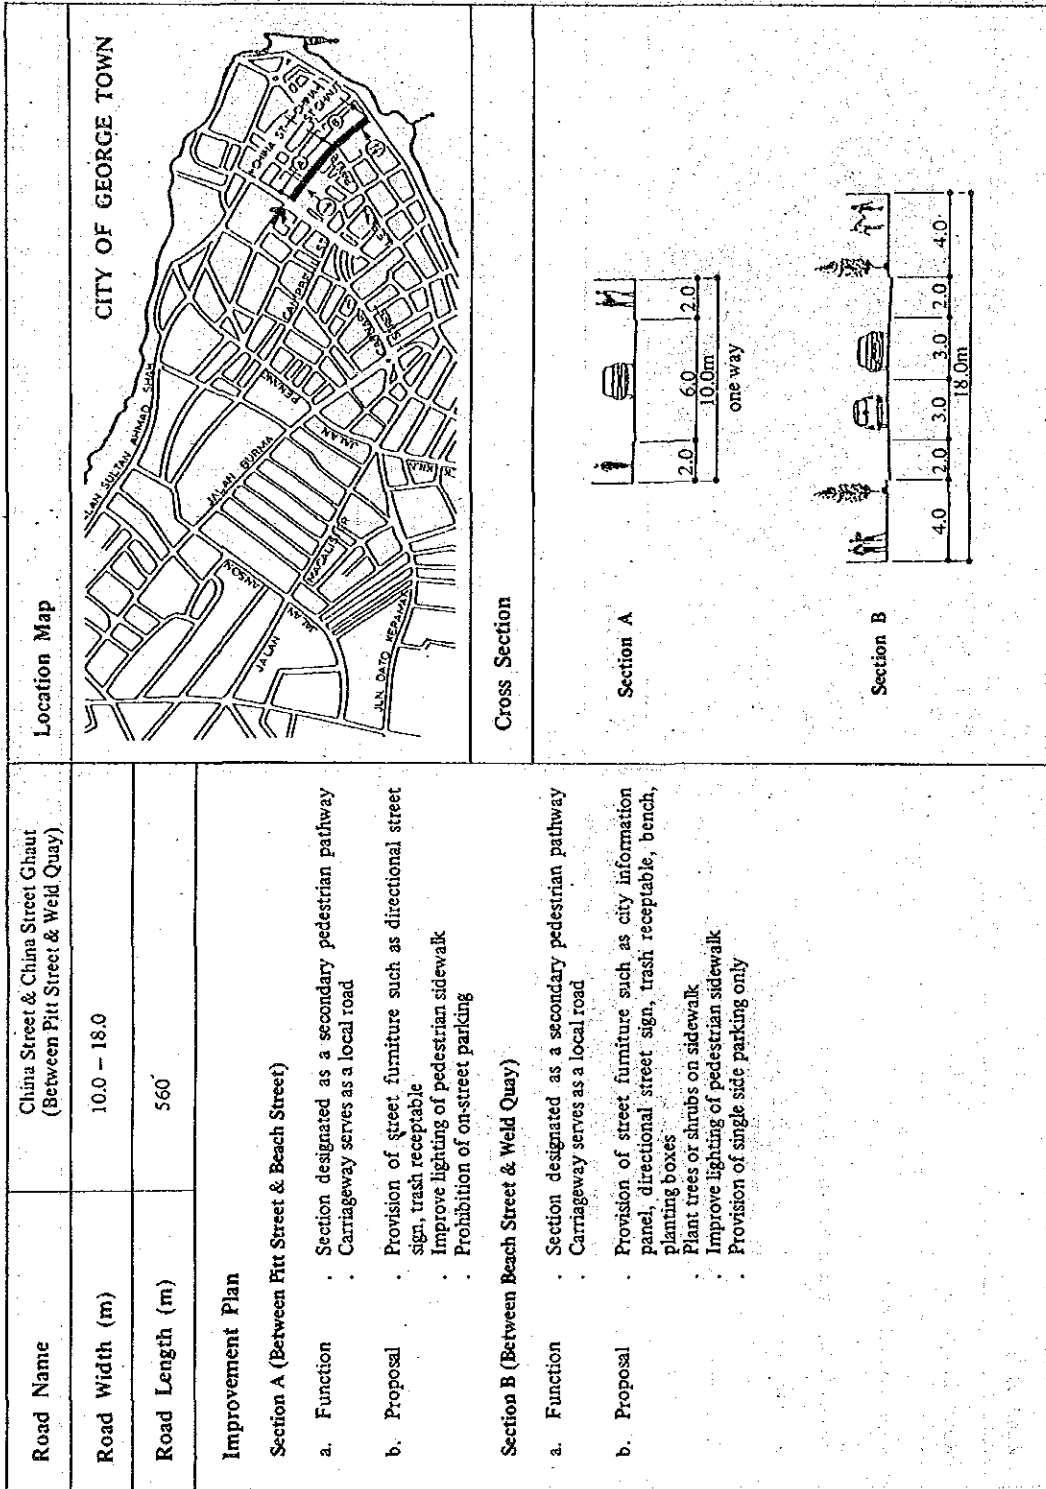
Pedestrianisation Improvement Plan (9) – China St. & China St. Ghaut
